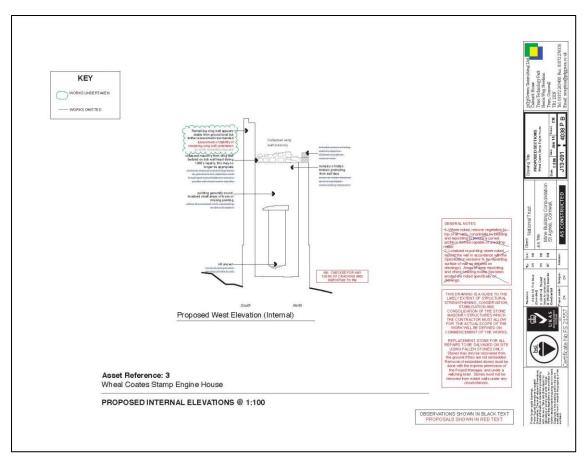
Western internal elevation of Wheal Coates stamps engine house.
